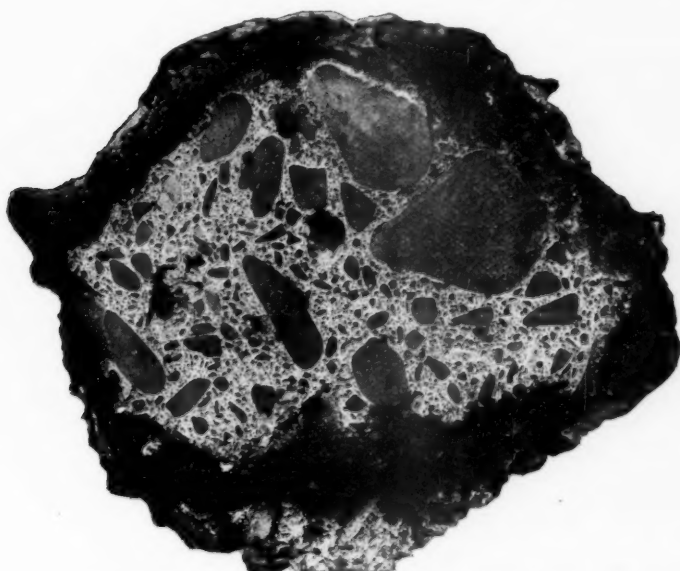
Field Concrete, 1 : 2 : 4. Wing Wall, Beebe Lake Dam ( $\frac{1}{3}$  size).
